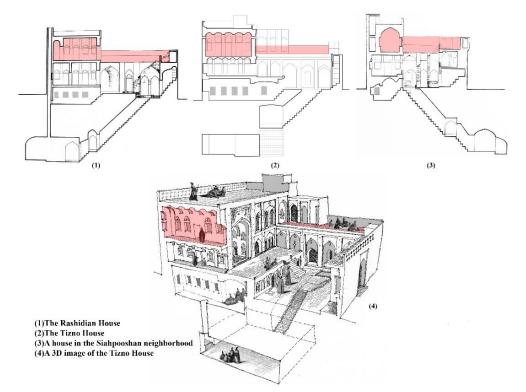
The Fifth Layer (Veranda, Yard on the Second Floor (*Pishboom*) and Second-floor rooms) (Source: Authors)
